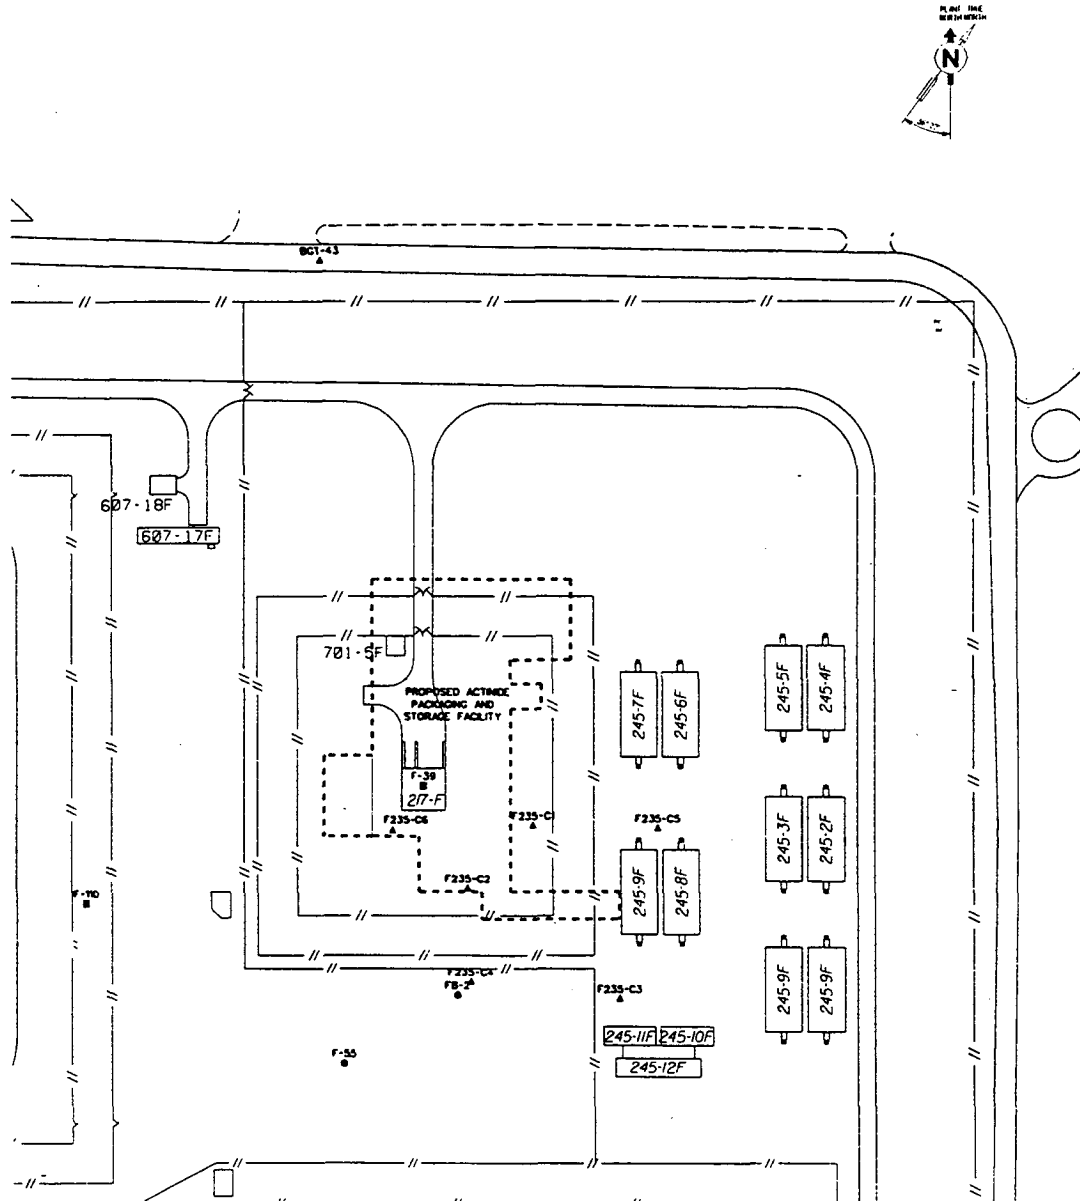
Site for Proposed Actinide Packaging and Storage Facility
